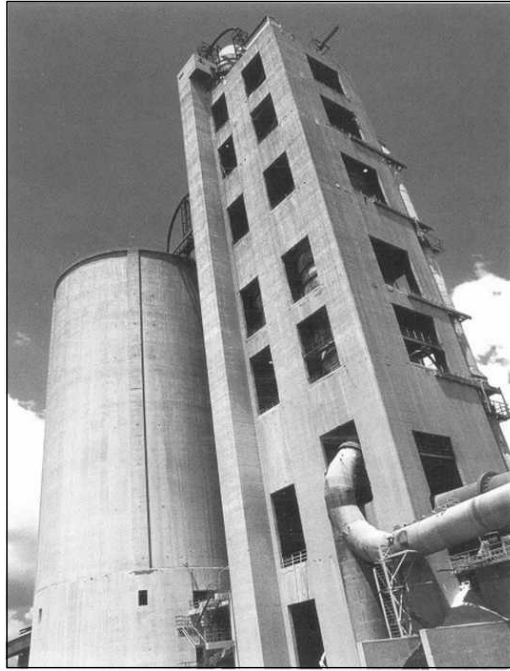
Slipformed CF Silo and Pre-heater at Madras Cements at Jayanthipuram.
